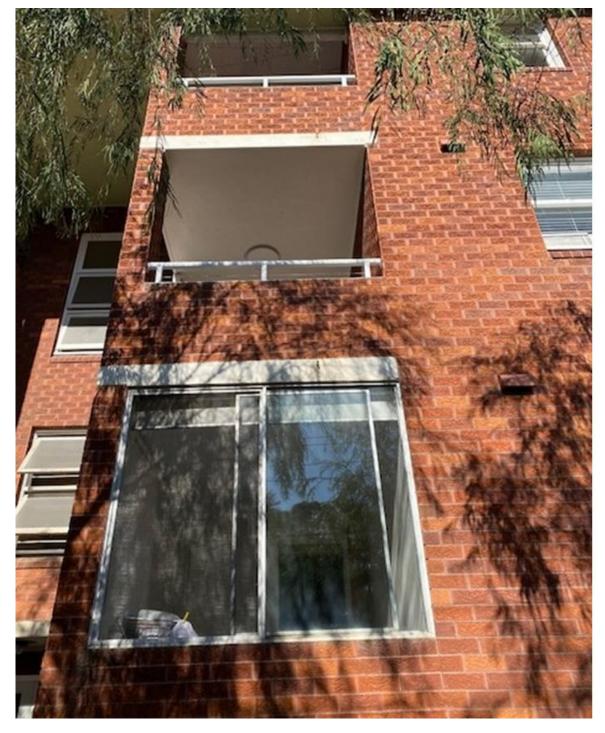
Proposed balcony to be enclosed, between the existing enclosed and upper level open balcony.
